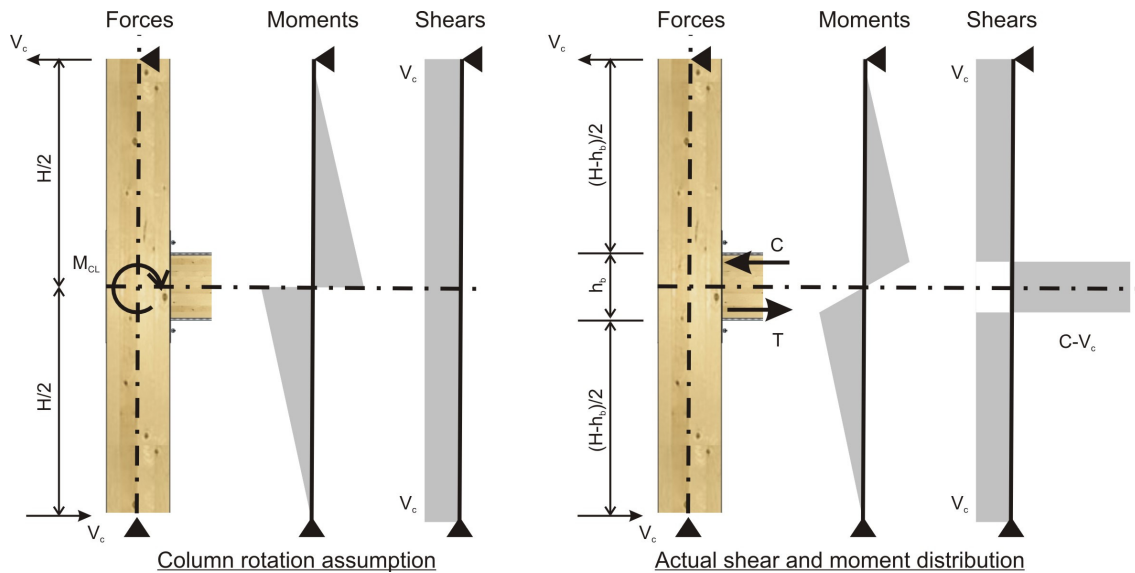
Flexural and shear deformation of the column in a post-tensioned timber beam-column joint
